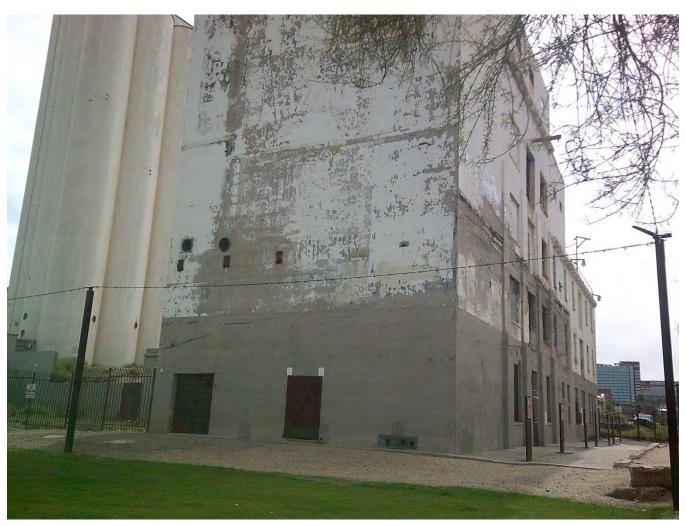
Overview of east and south elevations of mill building, view facing northwest (AZ MaricopaCounty_HaydenFlourMill_002b)
